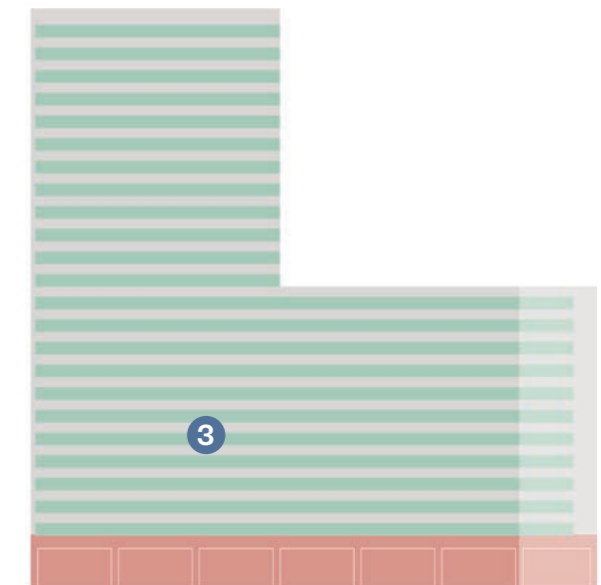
Building C (Enterprise Yard) Facade Principles - 02
